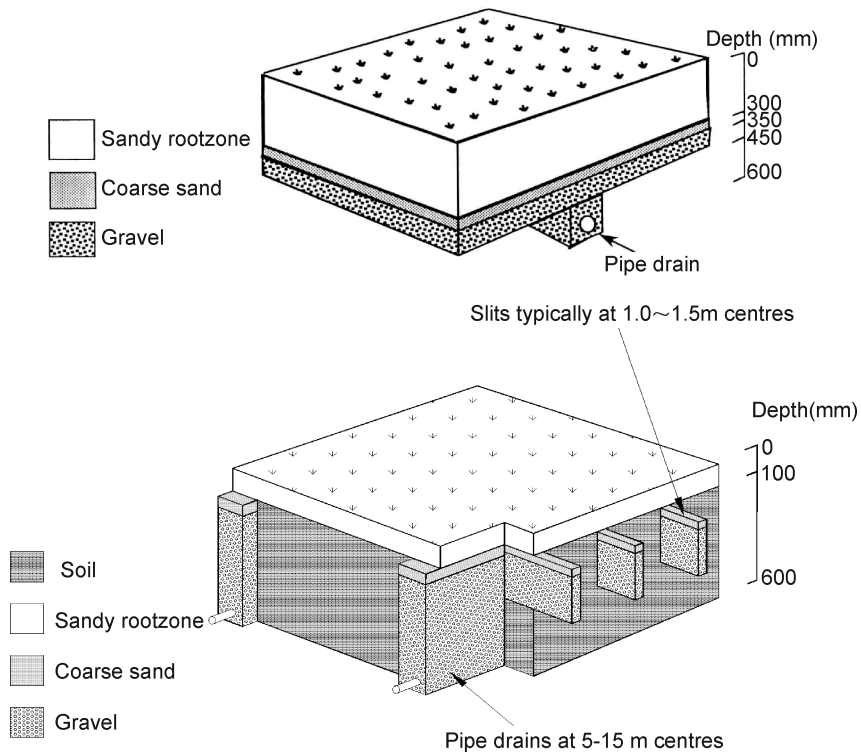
Typical construction profiles of suspended water table construction with rootzone overlying a gravel drainage layer (1a top) and the rootzone layer placed on top of the existing soil with varying levels of under-drainage (1b, bottom) (from Baker 2006) .
